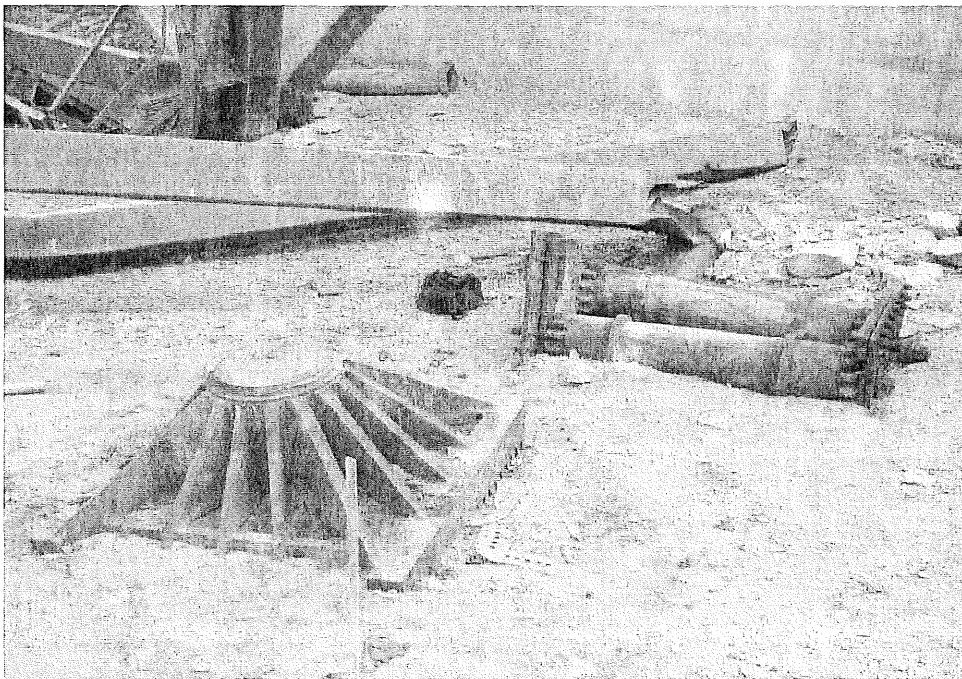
Post-collapse location of Pier 6 west bearing upper casting and rollers.
